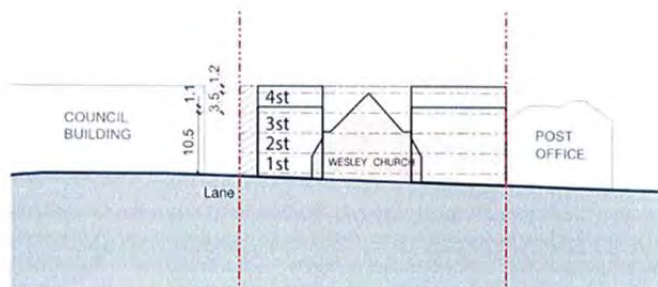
Wetherill Street _ Building envelope _ Commercial floor heights _ Section B-B
